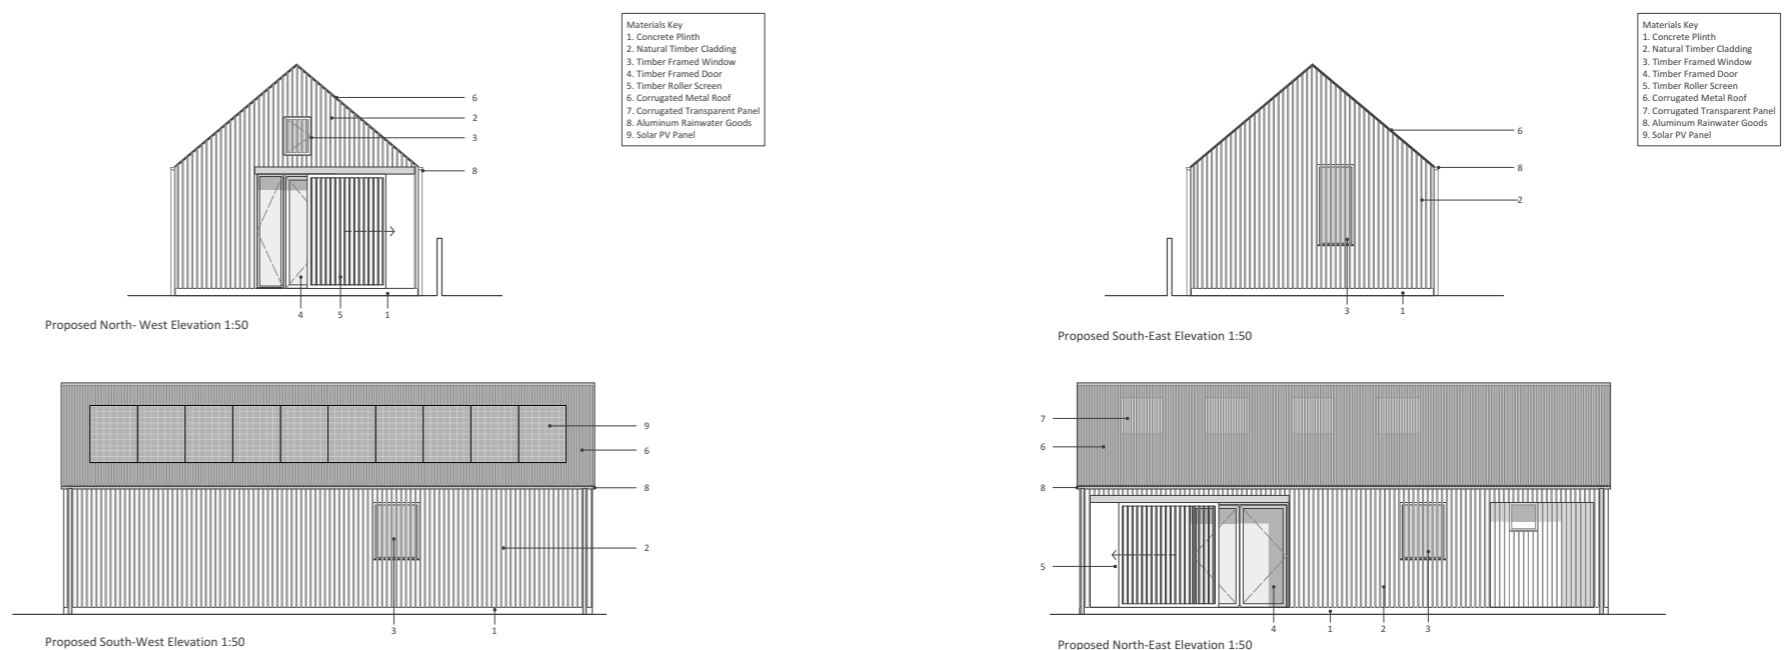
+27_ Proposed Workshop Elevations NOT TO SCALE
